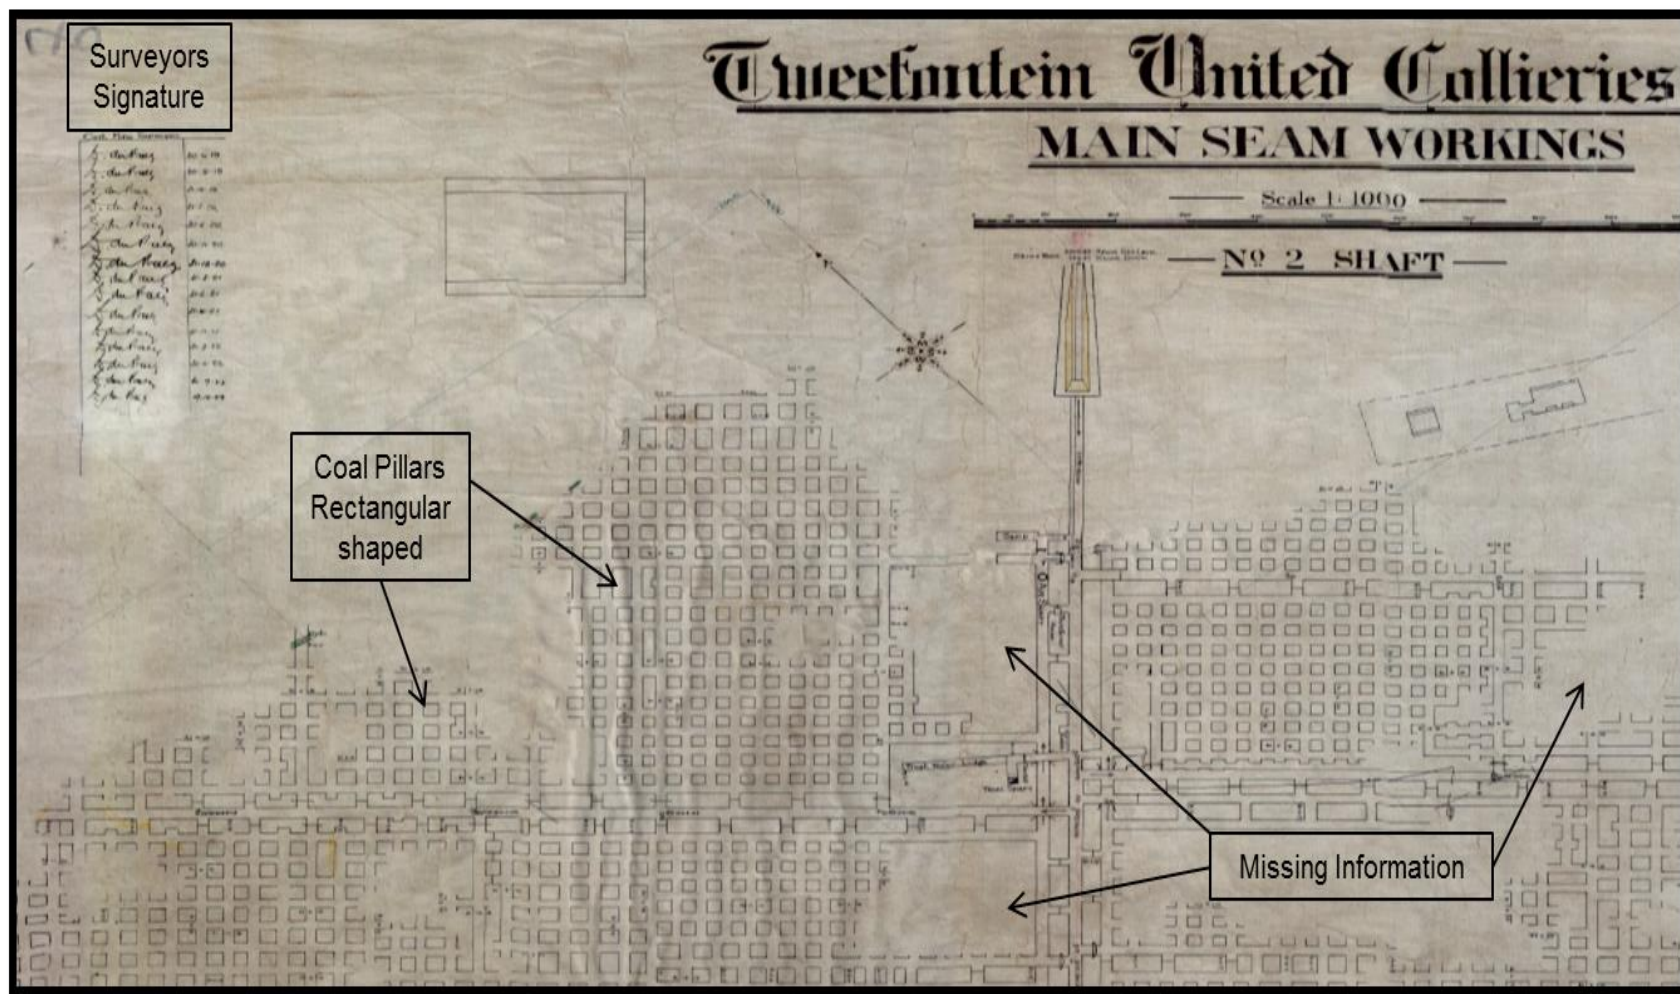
Typical underground plan in the earlier years of mining (Tweefontein Opencast Colliery, 2015)
